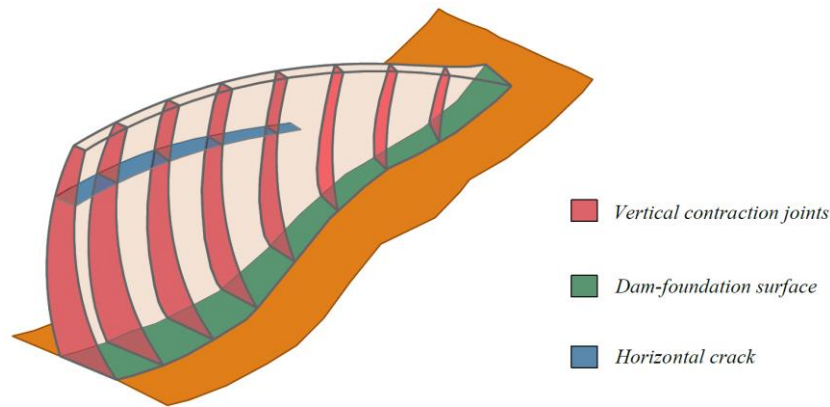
Arch dam. Vertical contraction joints, horizontal crack, and dam-foundation surface.
